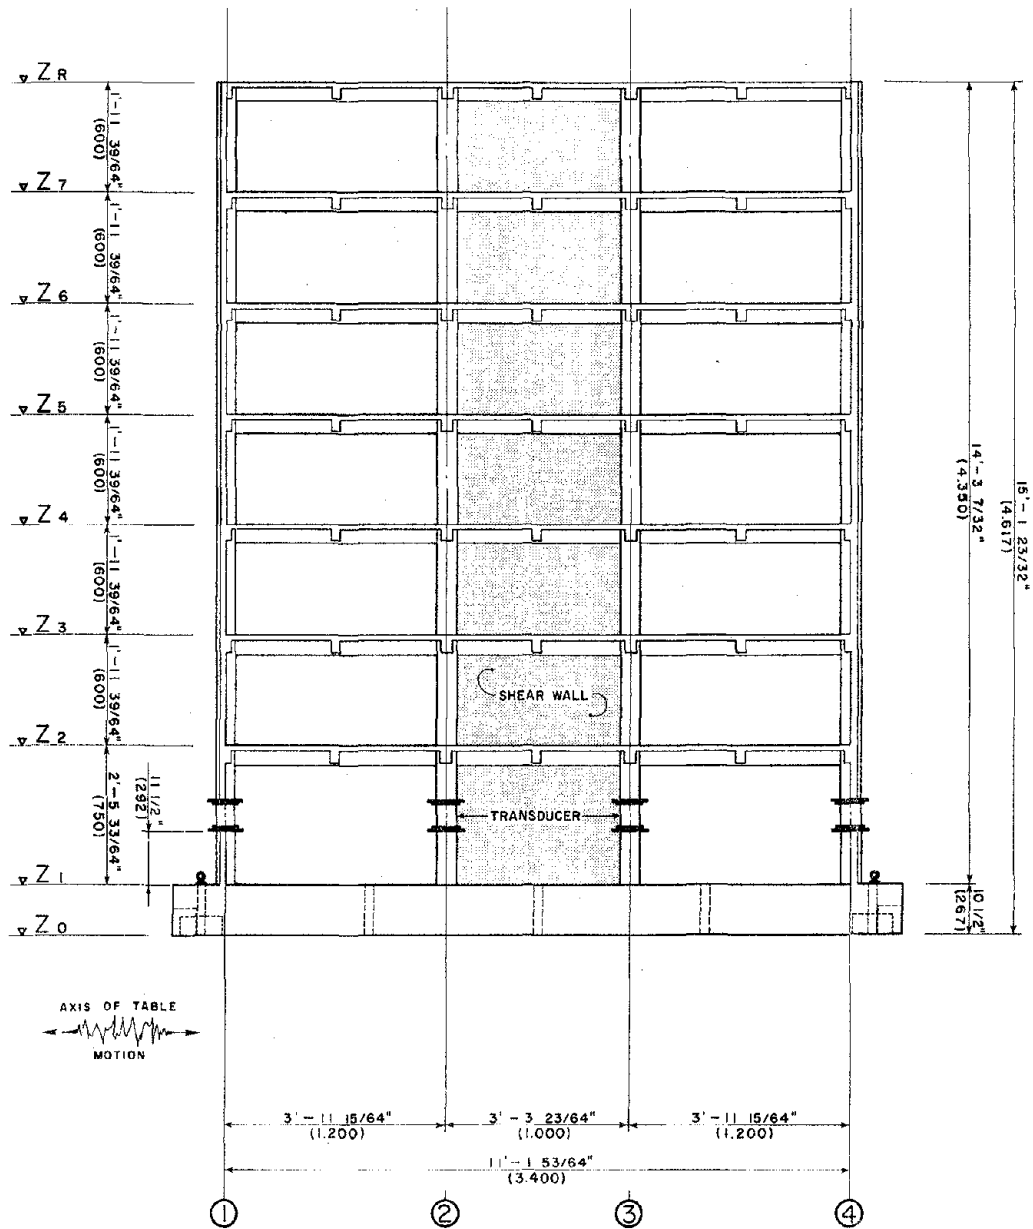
LONGITUDINAL ELEVATION OF 1/5 SCALE MODEL.
